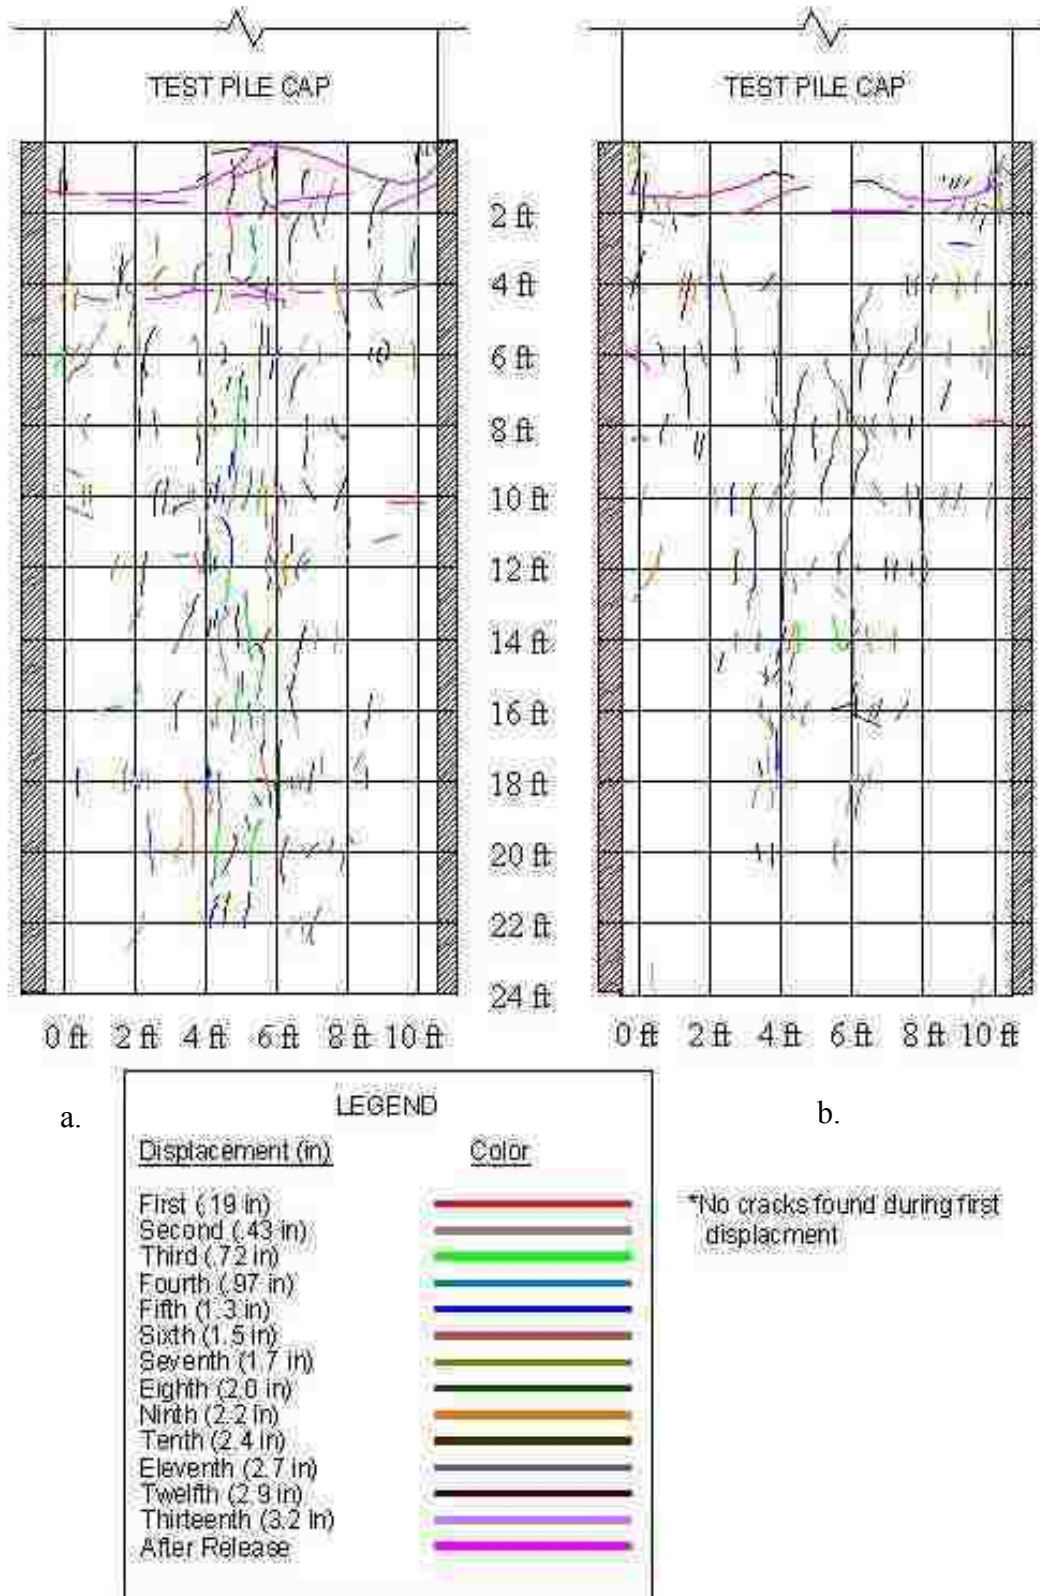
Crack map for a.) MSE wingwall test 2 (repeat of Figure 8-16) and b.) MSE wingwall test 1 (repeat of Figure 7-15).
